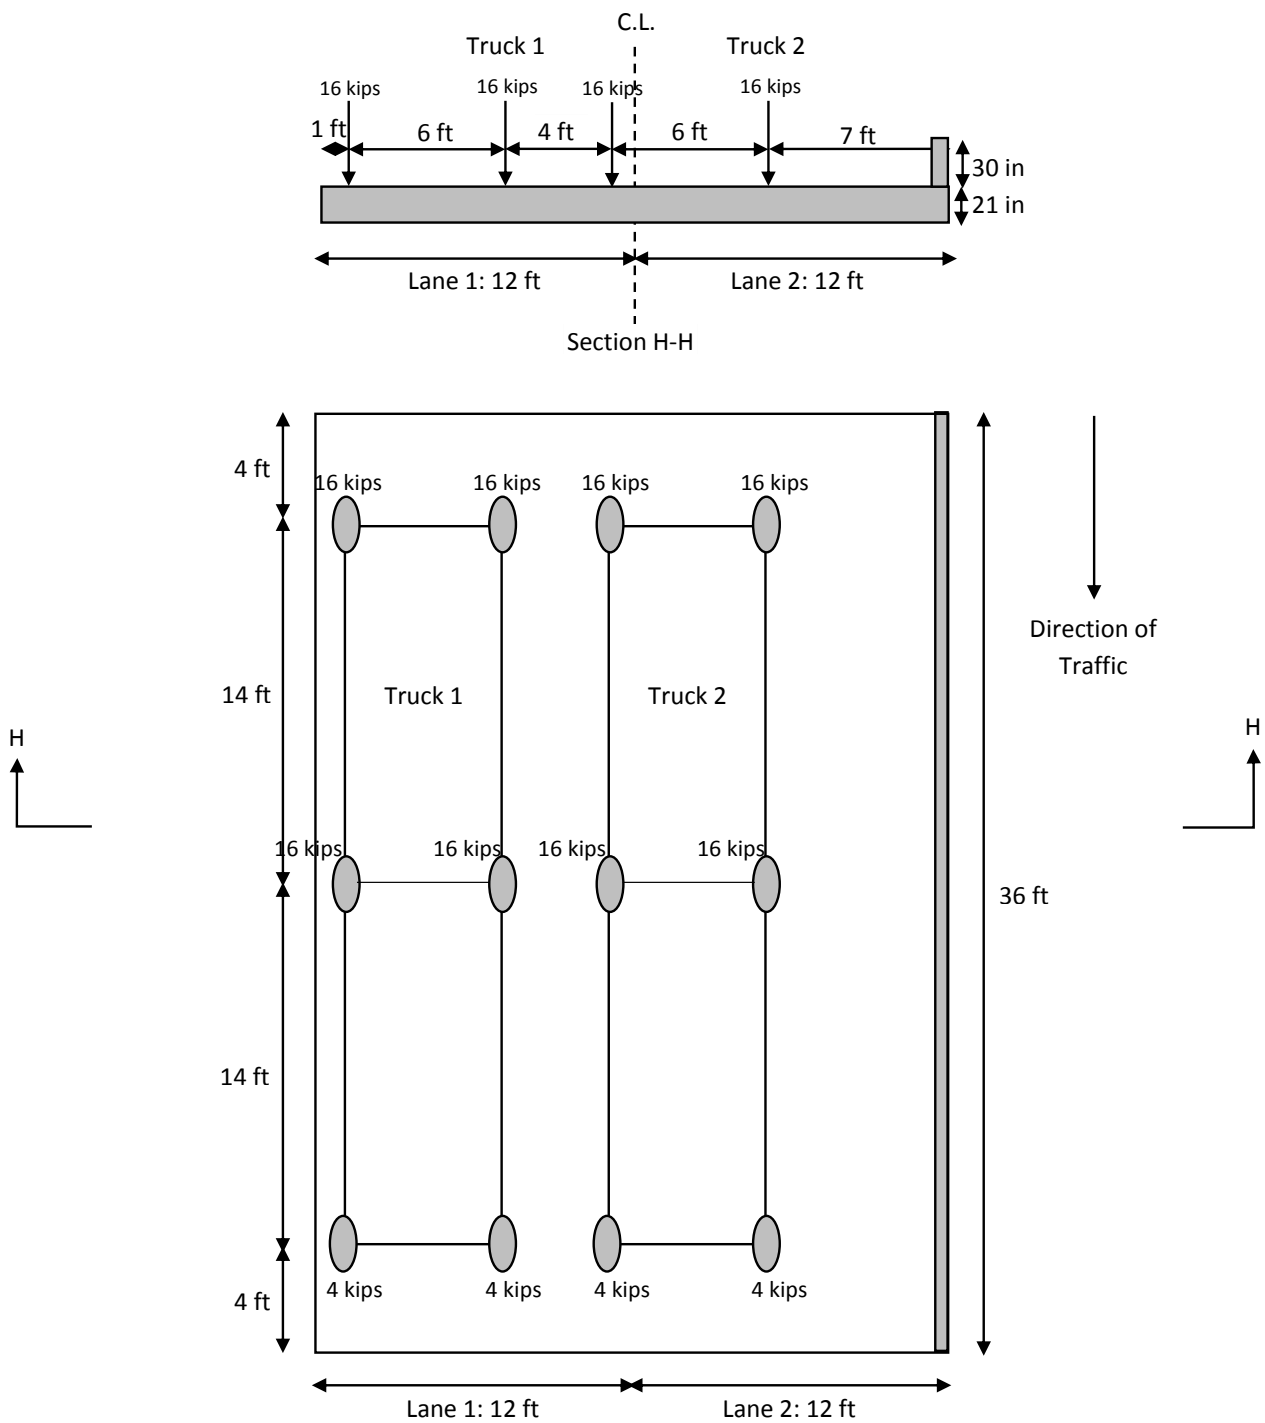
Typical Cross-Section and Plan of a Two-Lane 36 ft Span Straight Bridge with One Railing under Edge Loading E1.
